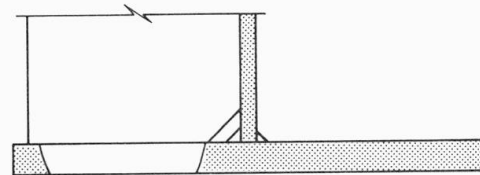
Typical Failure at Stiffeners Welded to Web and Flange.
